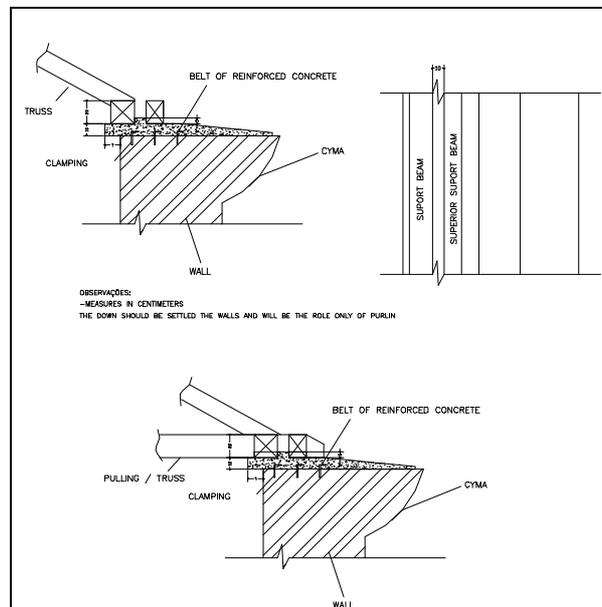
Detail Showing the contact between the truss and the wall plate.
